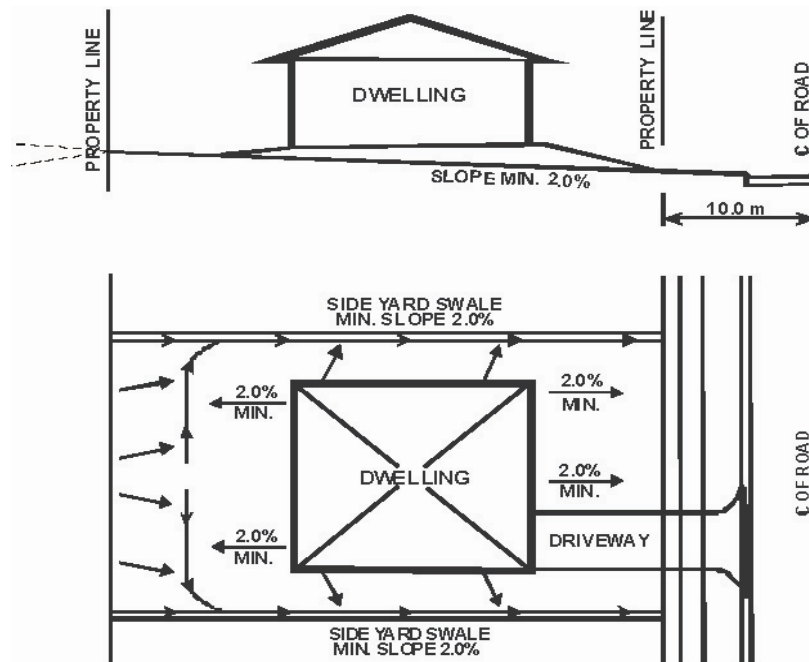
Typical Residential Back-to-Front Drainage Swale Layout
